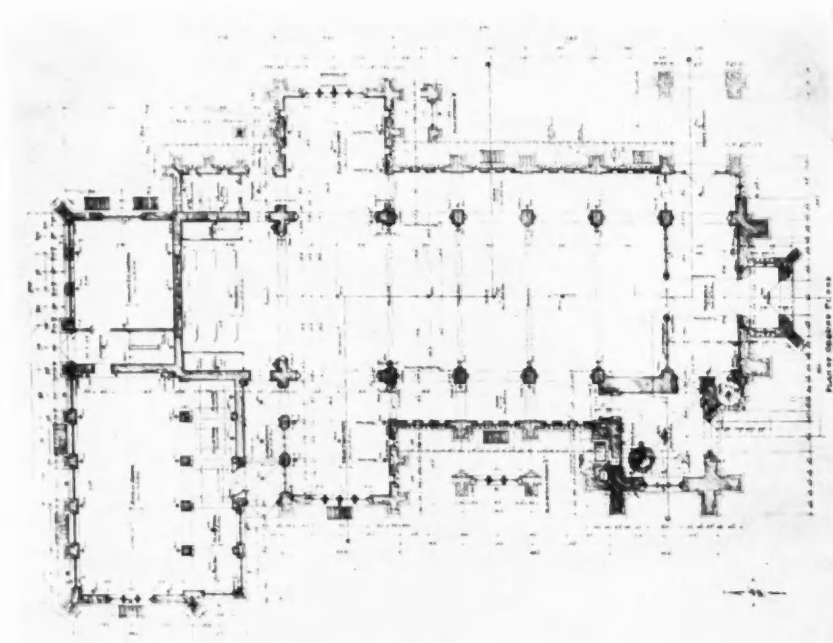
FIRST PRESBYTERIAN CHURCH, SYRACUSE, N. Y. MODERN TRADITIONAL PLAN.
